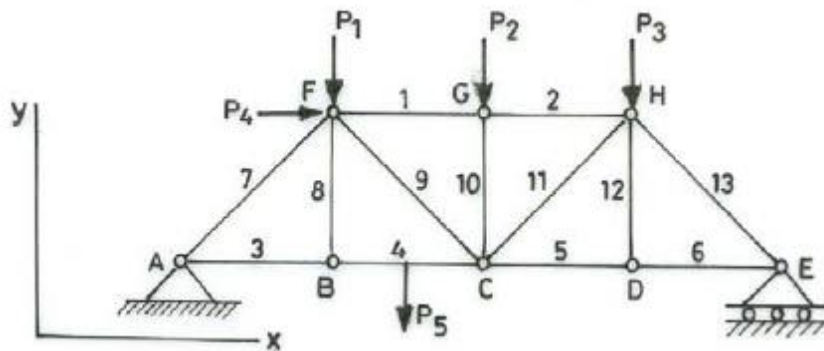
Pin Jointed Plane Truss Subjected To Member And Nodal Loads.
